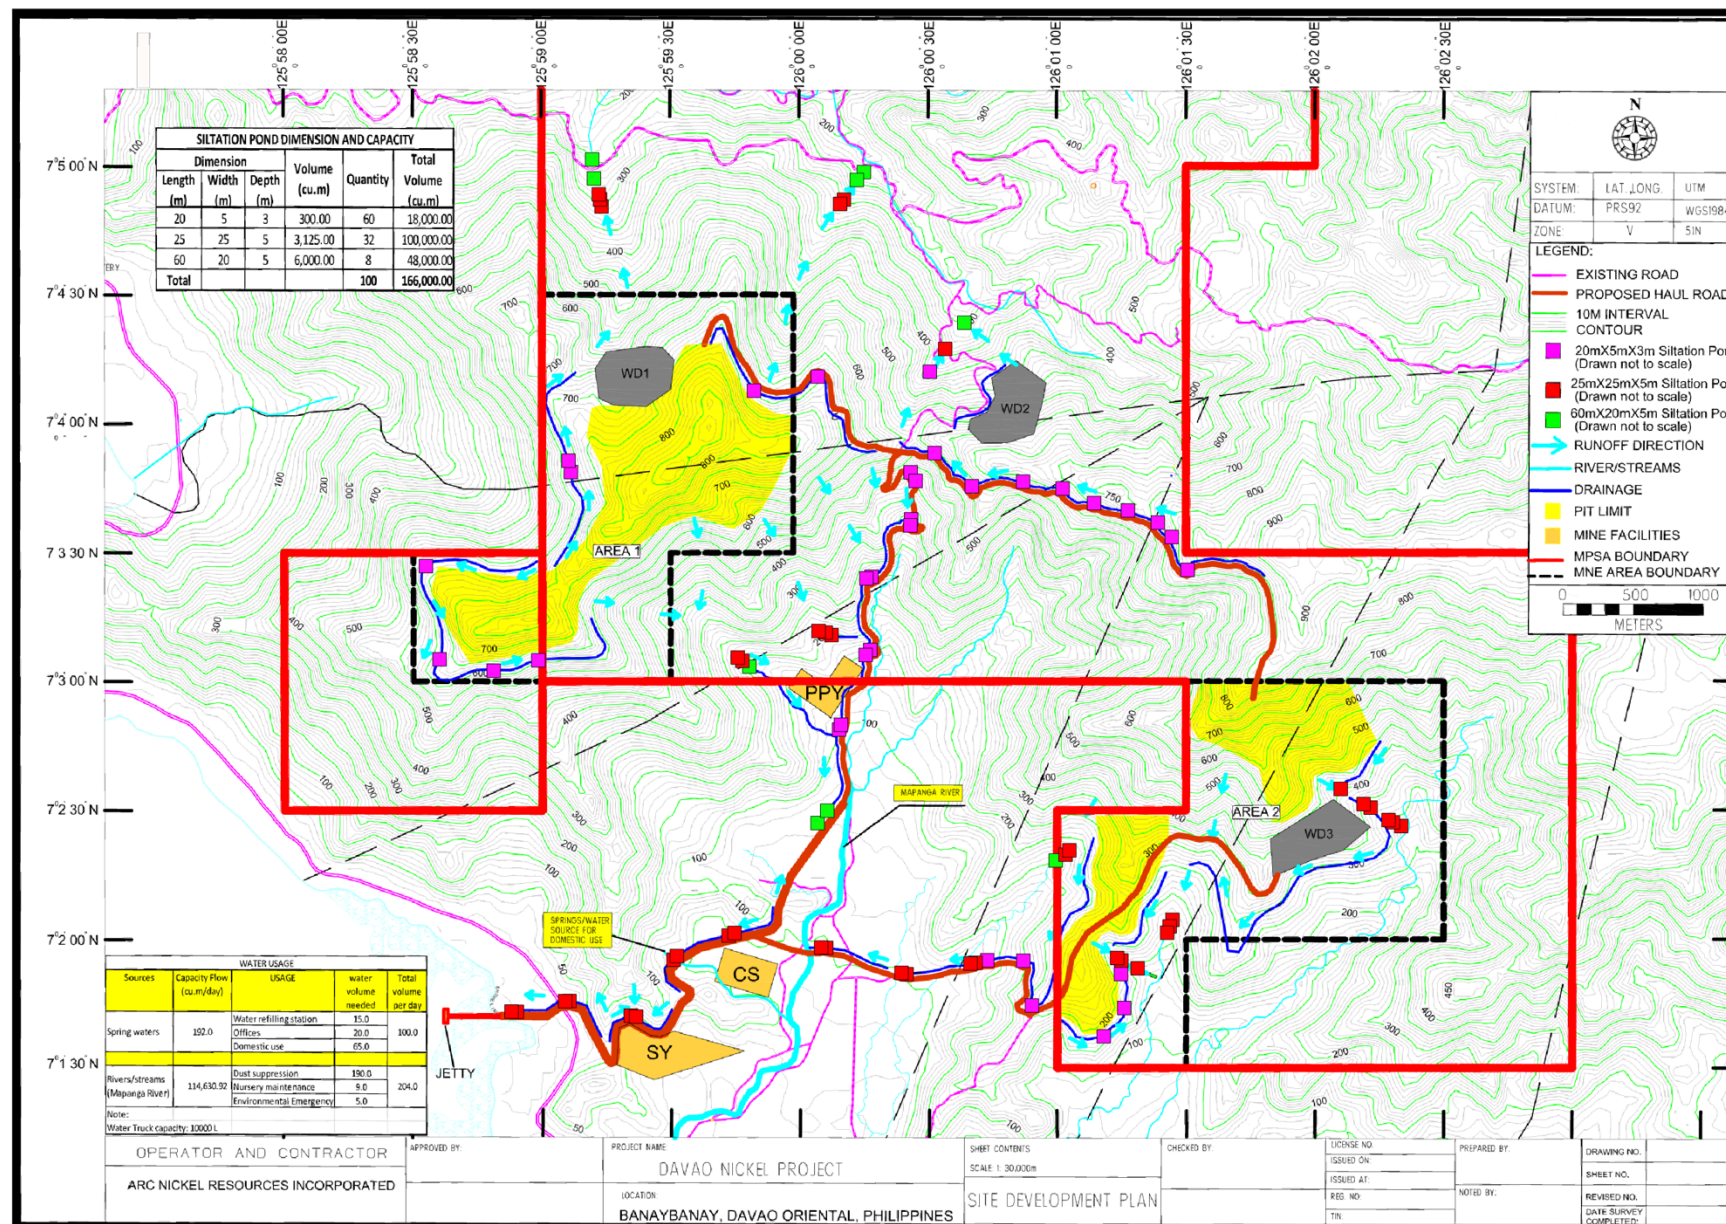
Site Development Plan showing the Location of Water Sources and Siltation Ponds (Source: RCMC)
